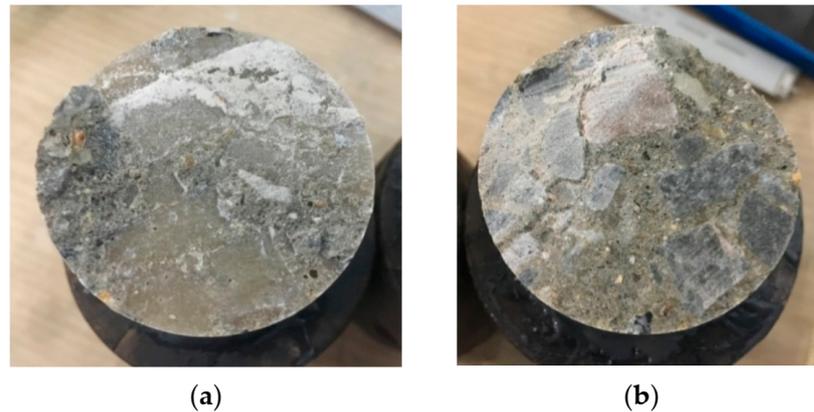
Debonding failures of the sample of F1 without cracks (a) lower end-face; (b) upper end-face.
